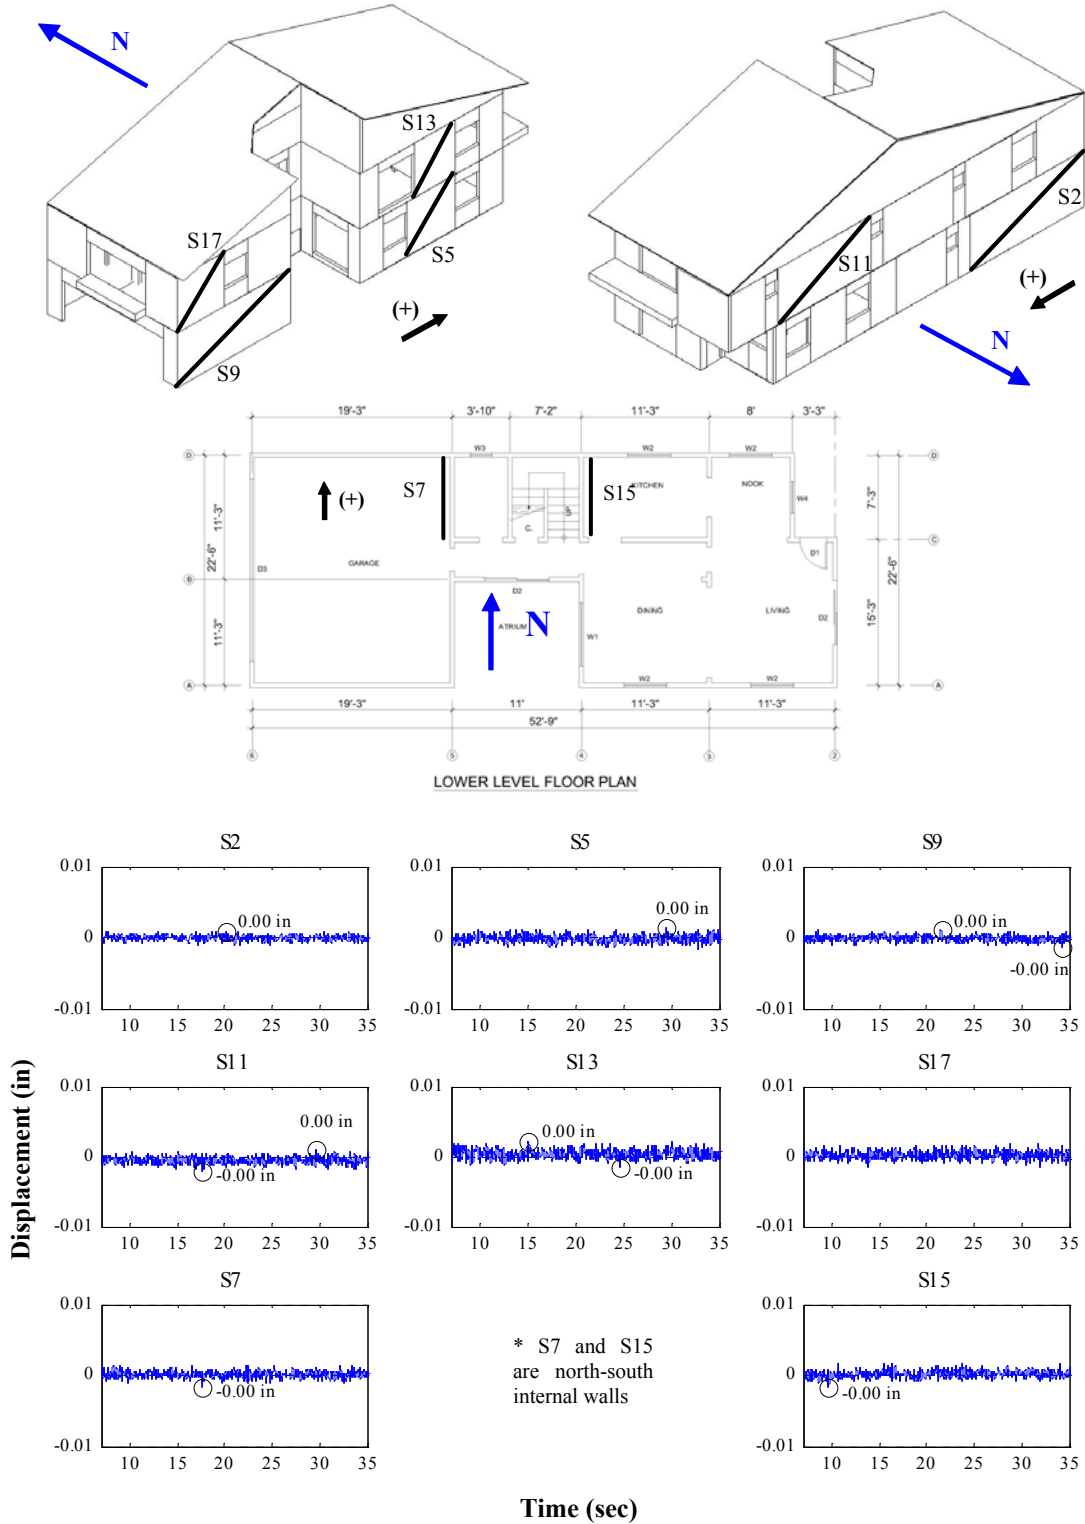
Wall deformations of east-west internal walls for Test NWP2S08
